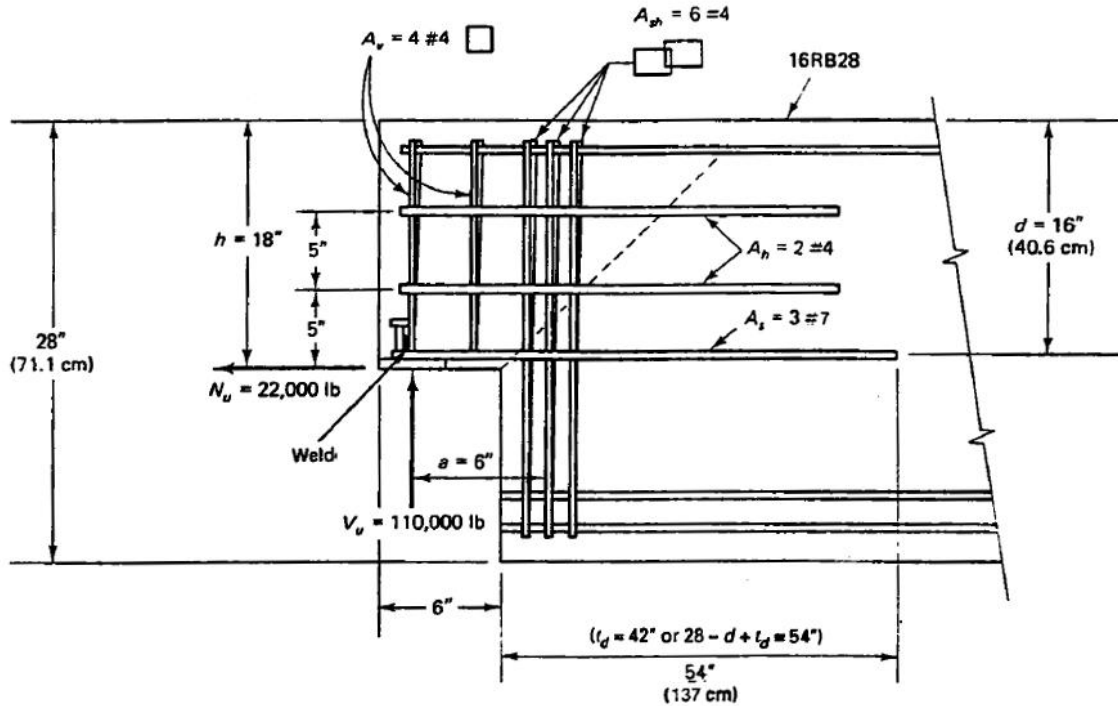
Reinforcing details for dapped-end beam connection in Example 10.2.
